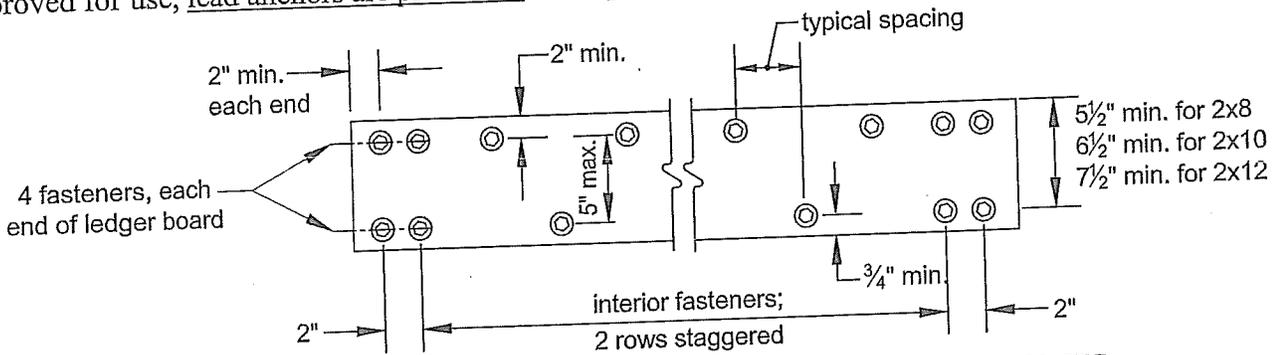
LEDGER BOARD FASTENER SPACING AND CLEARANCES
